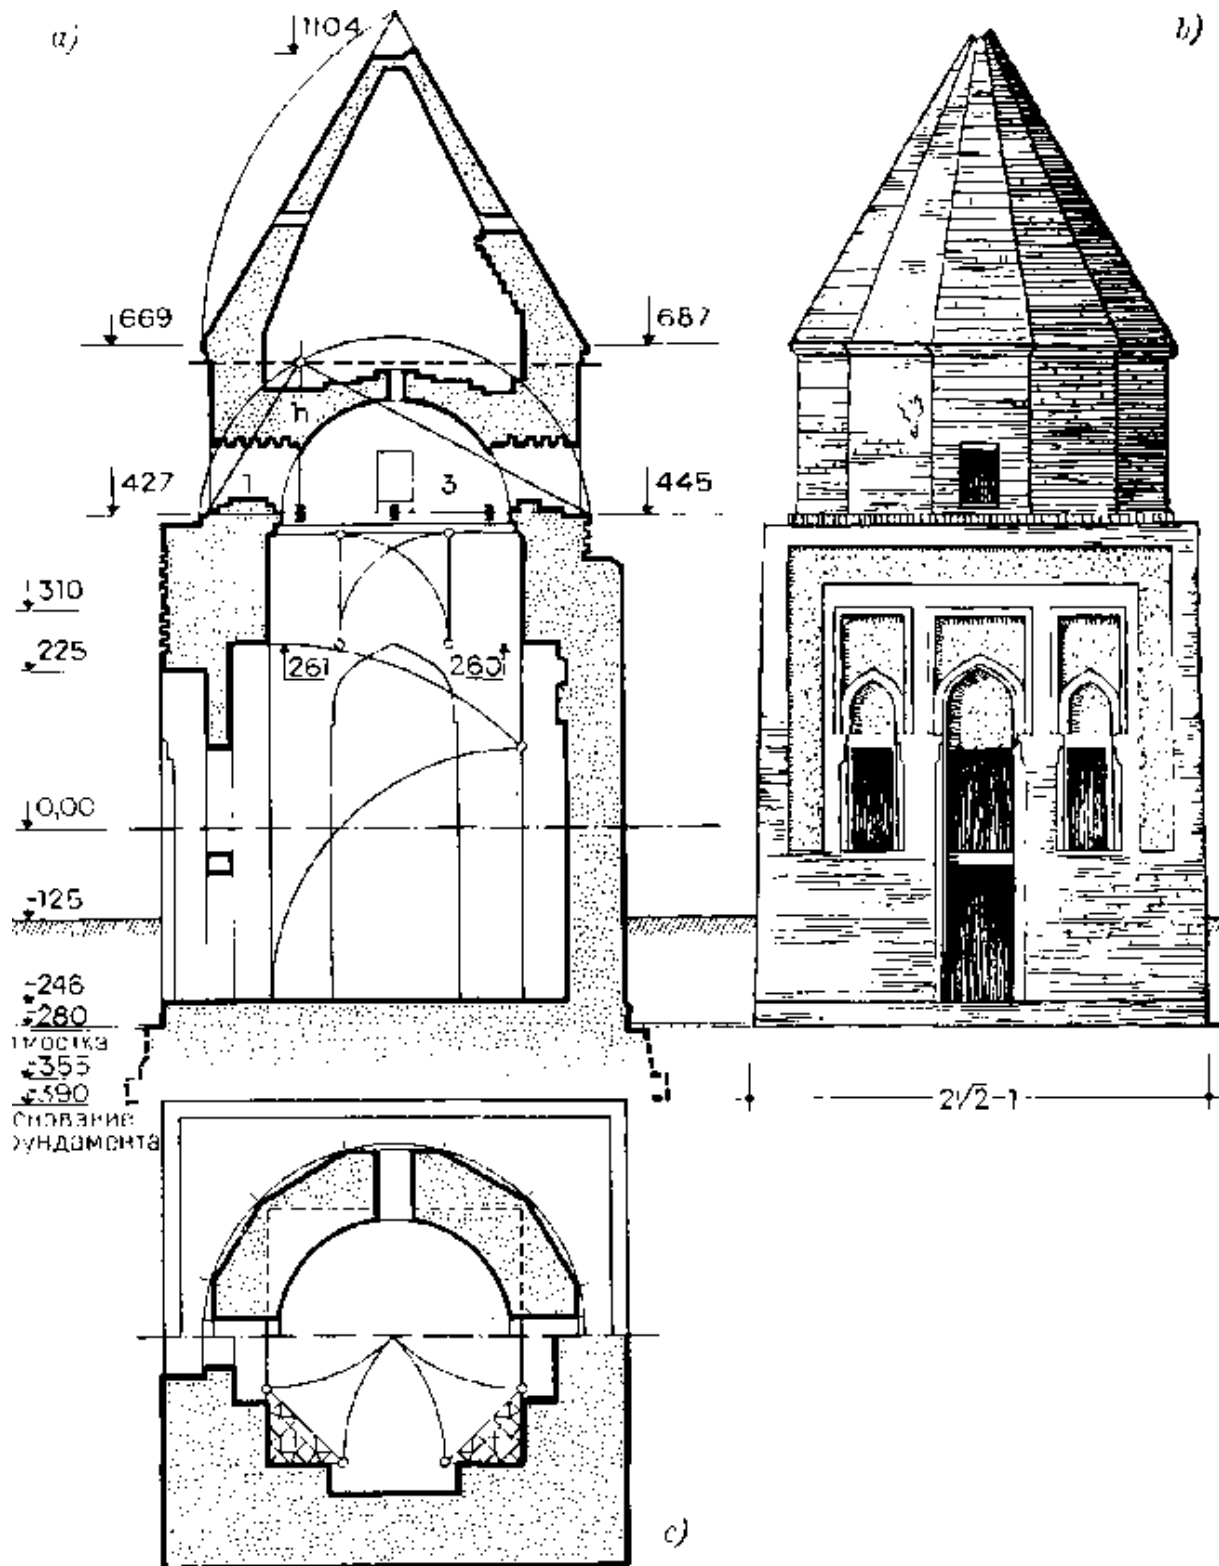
Mausoleum of Fakhraddin Razi. Plan and section. Building Analysis
